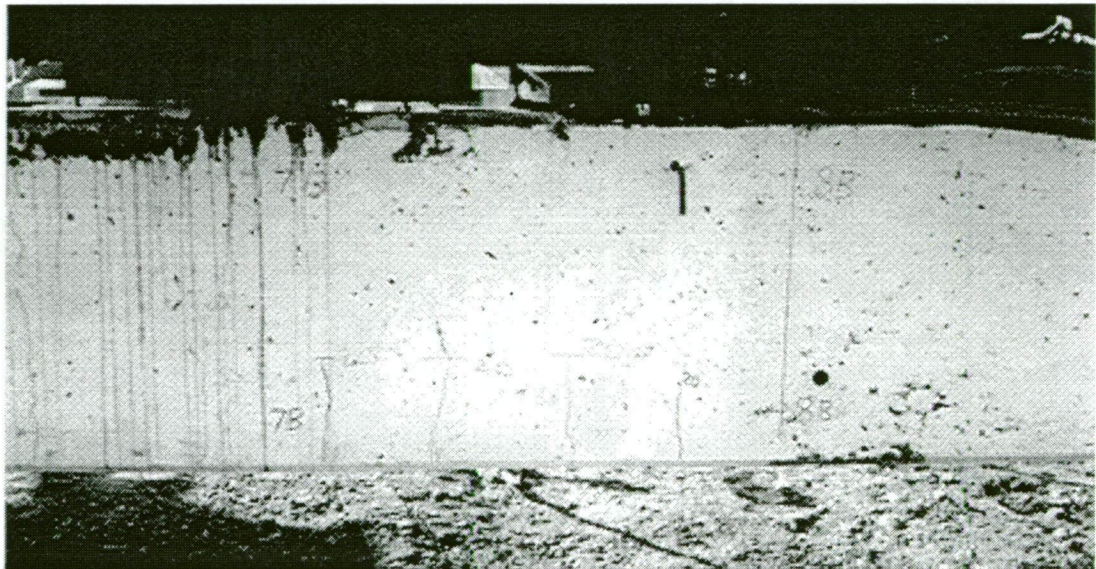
Flexural Beam Crack Patterns
